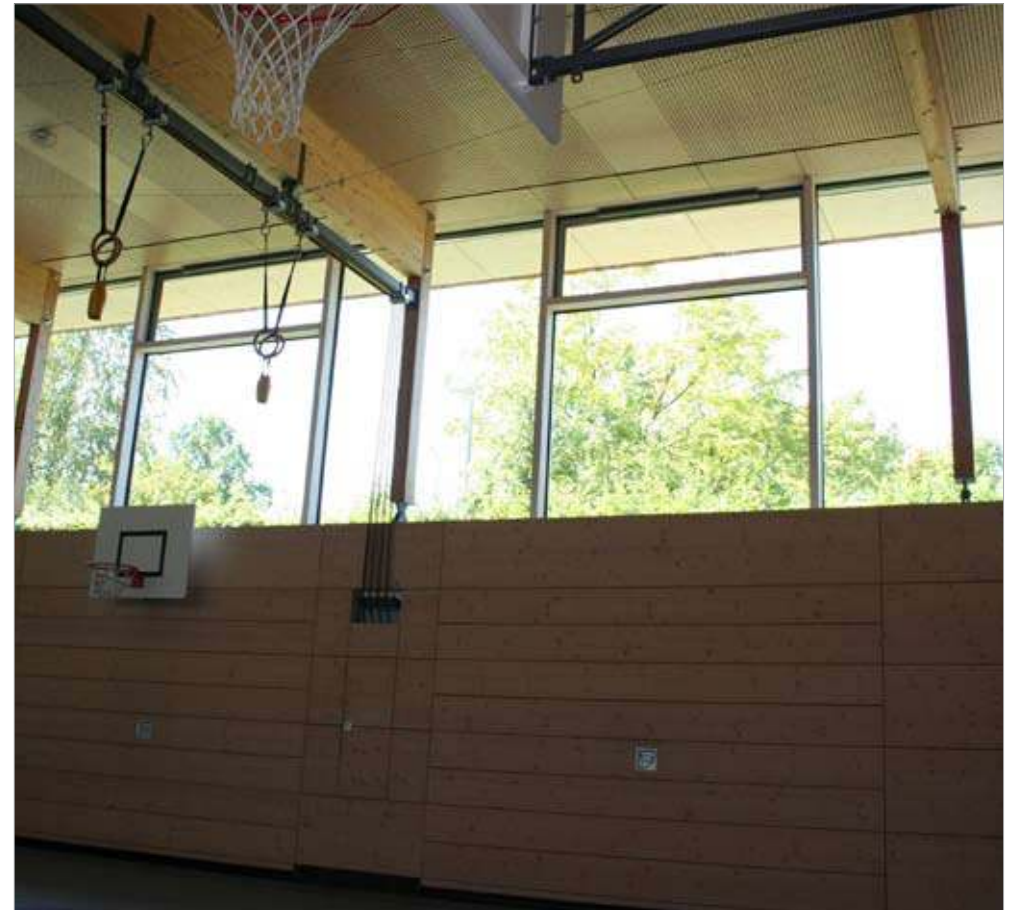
The windows in the top section of this glazed facade can be opened if necessary to provide for cooling when needed
